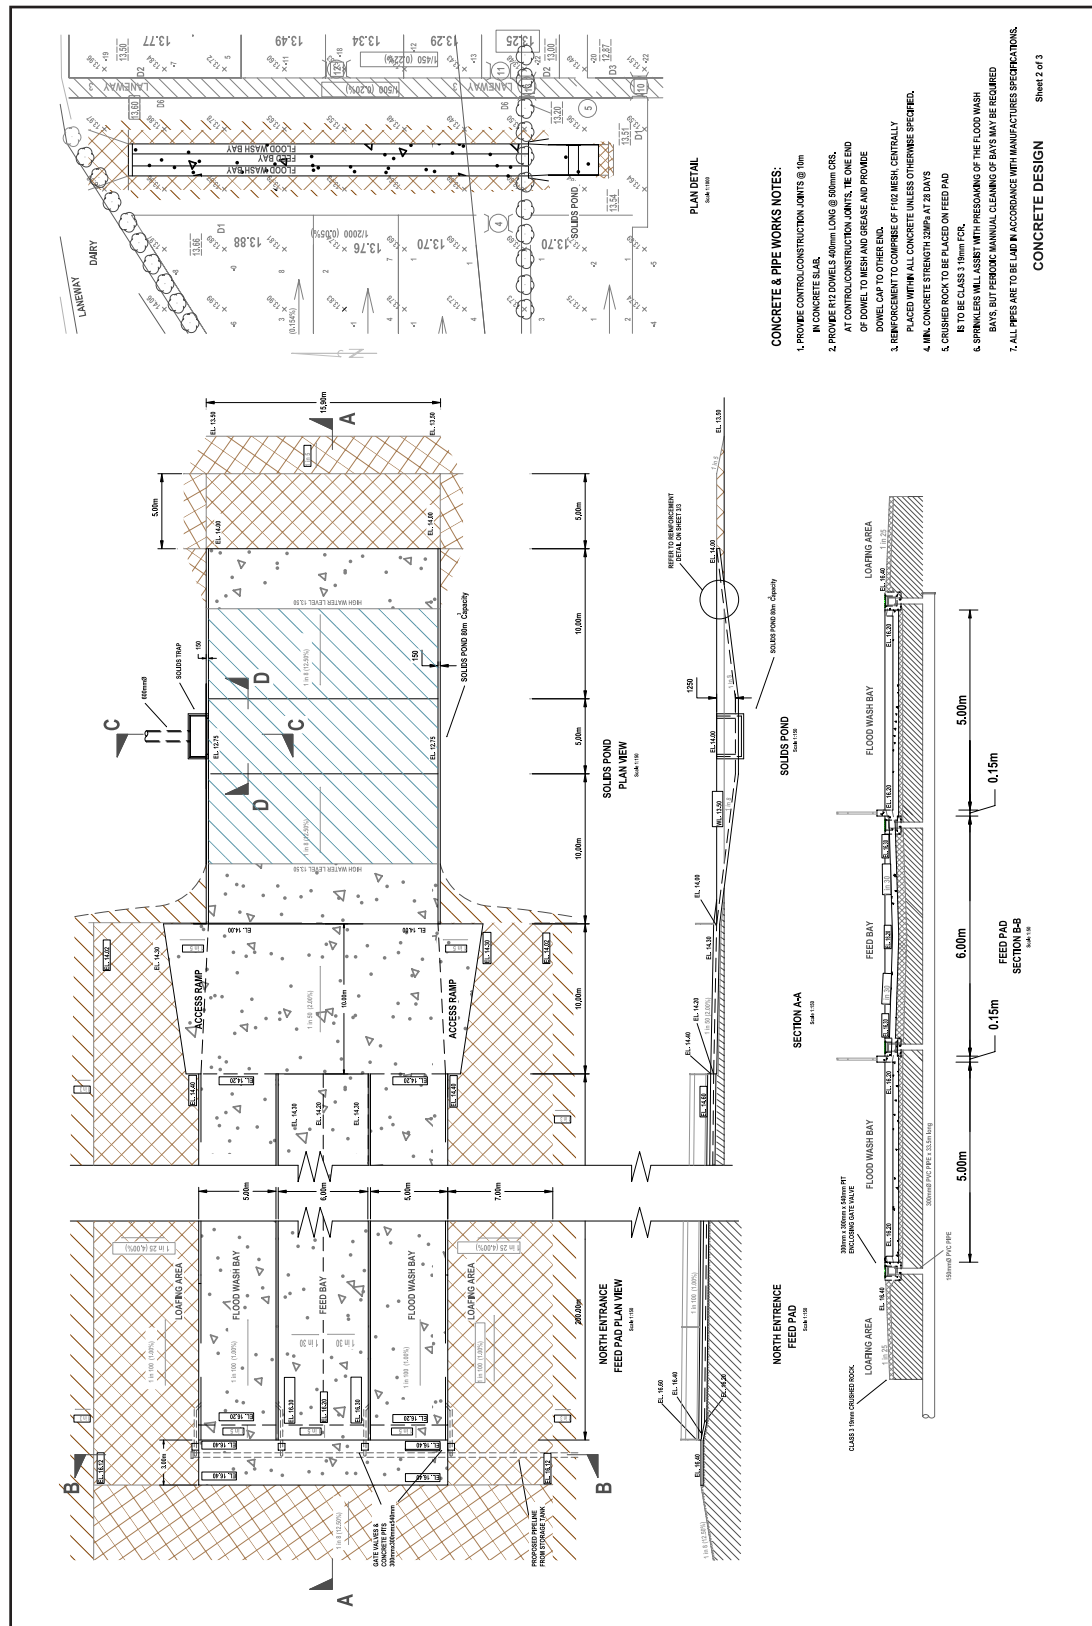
Feedpad Drawing - These plans provide a good example of the level of detail that should be included in a feedpad plan.
